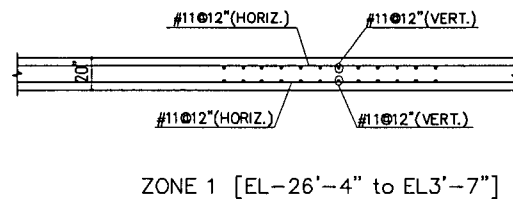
Typical Reinforcement in South Exterior Wall – SECTION 1
